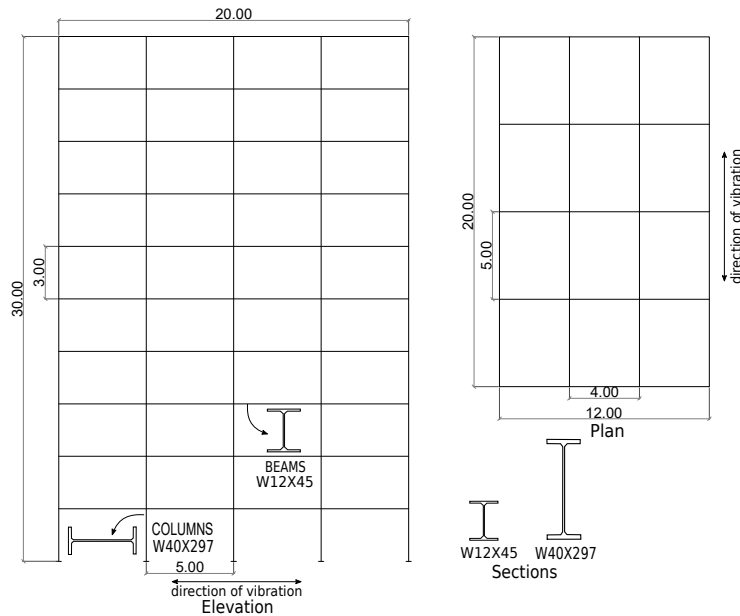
Elevation (left) and plan view (right) of the studied steel structure (all dimensions are in m).
